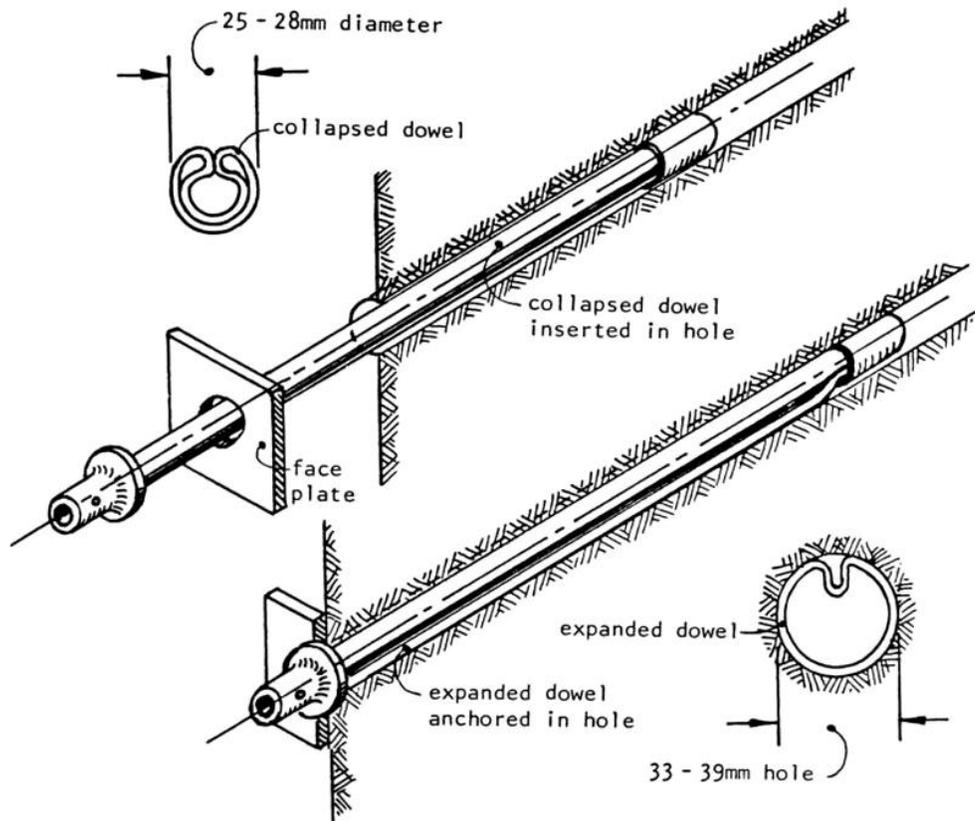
Atlas Copco 'Swellex' system of untensioned rock reinforcement.
